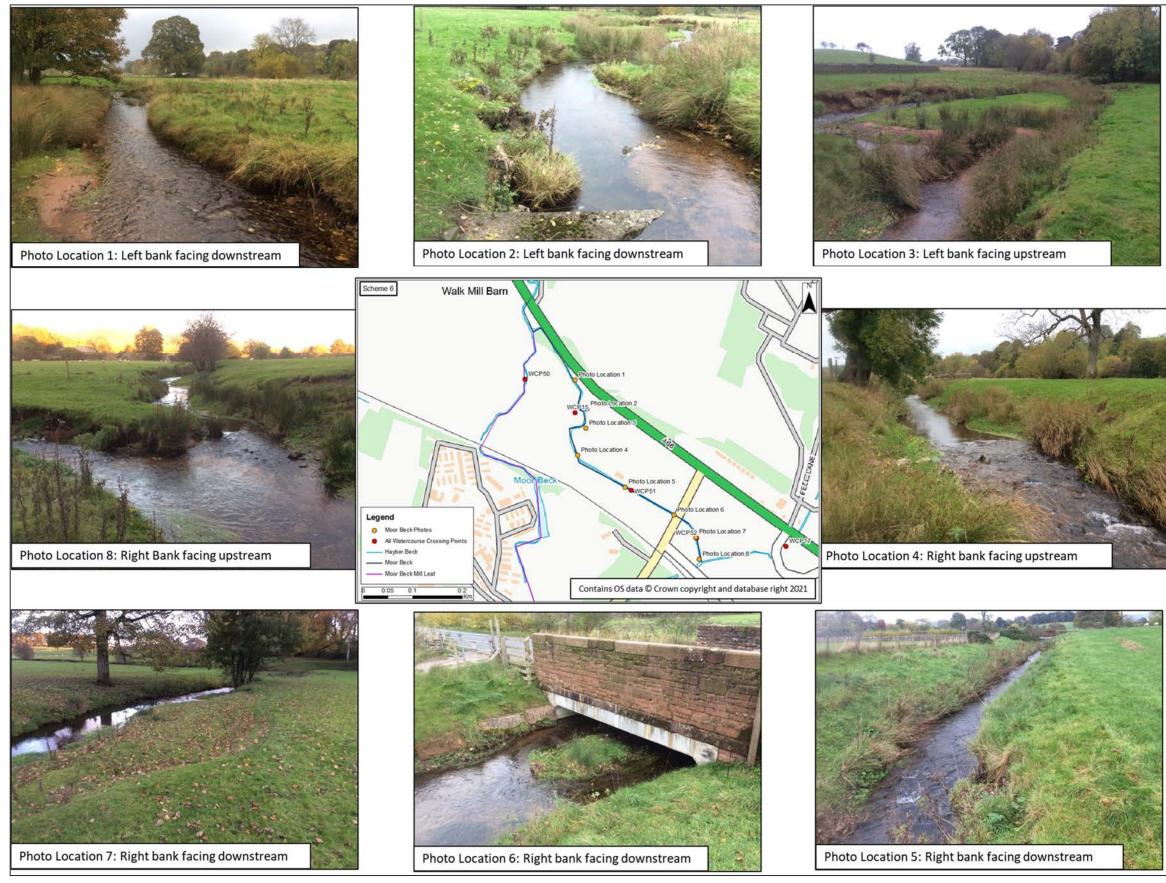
WCP15, WCP51 (Moor Beck) site photograph locations
